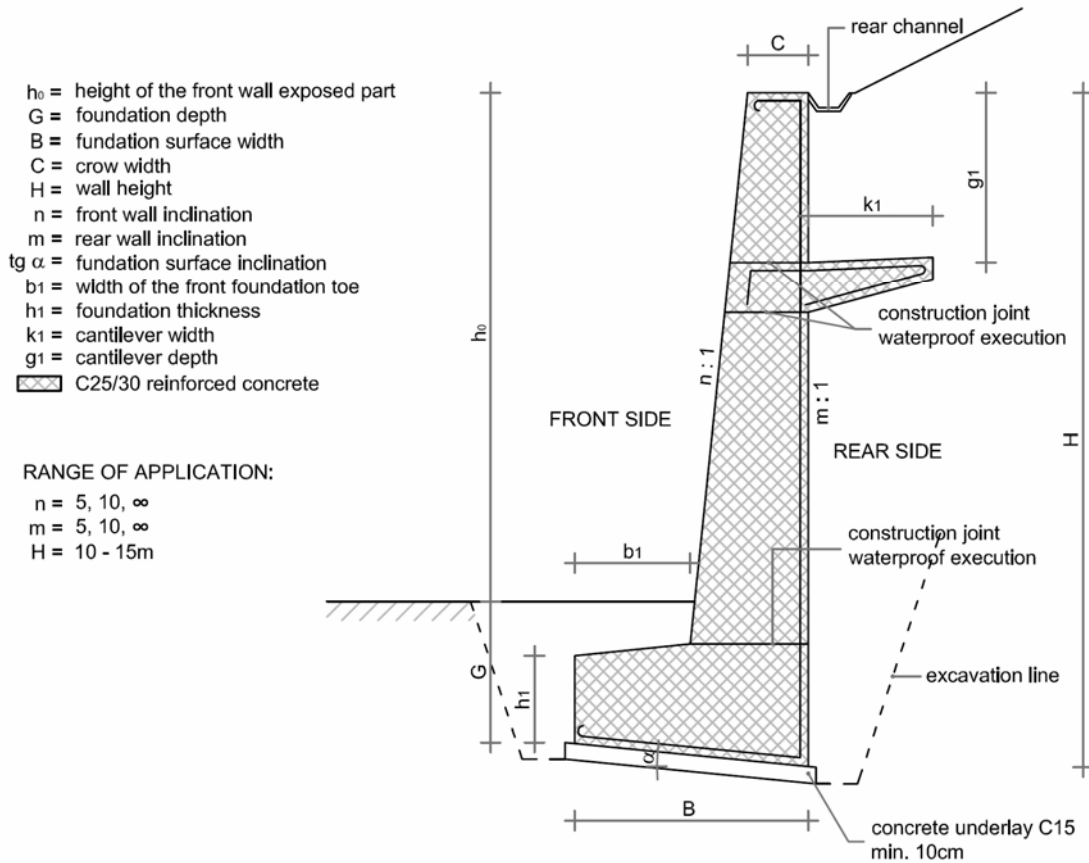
Reinforced concrete gravity retaining wall, with a rear cantilever
